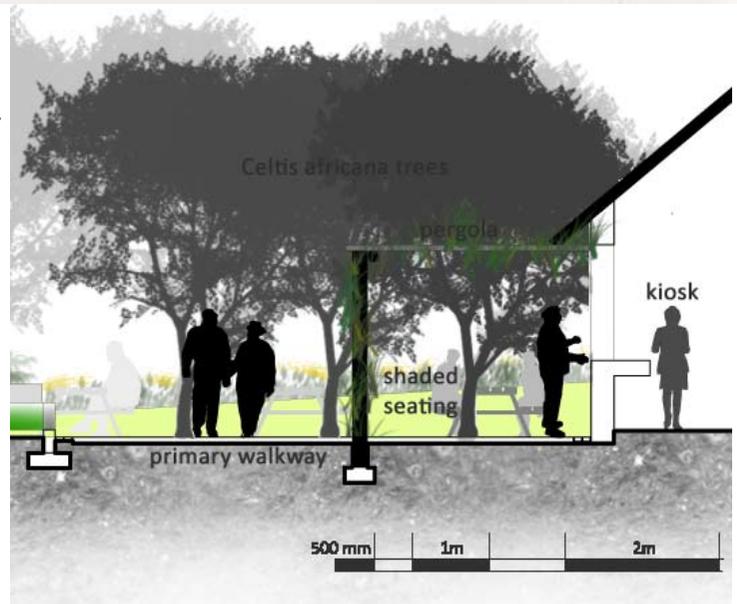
(top): Kiosk exterior plan (Author, 2009).
